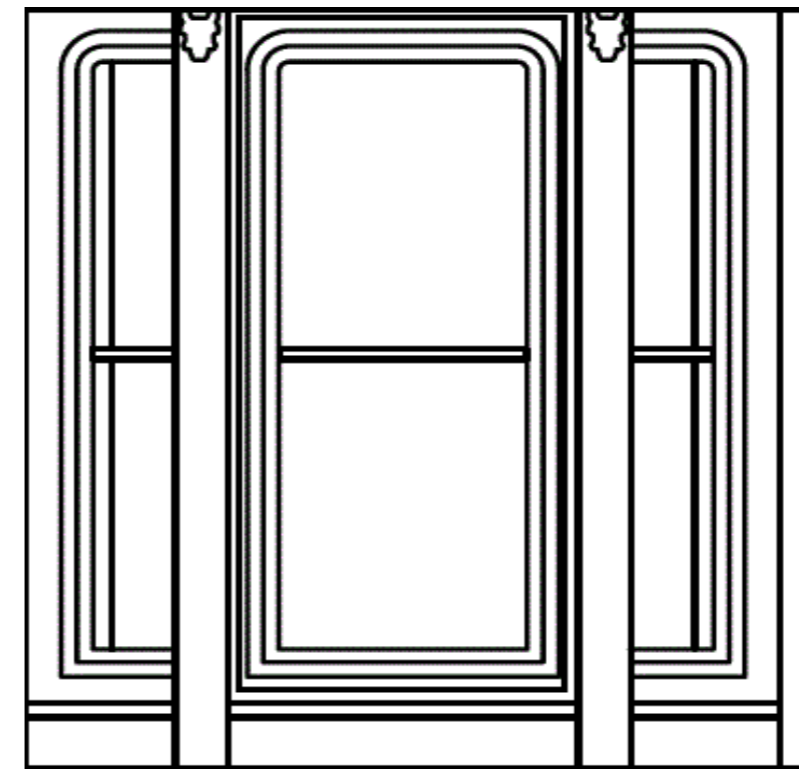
Existing Front Upper Ground Floor central bay sliding sash windows (with horizontal meeting rails).
